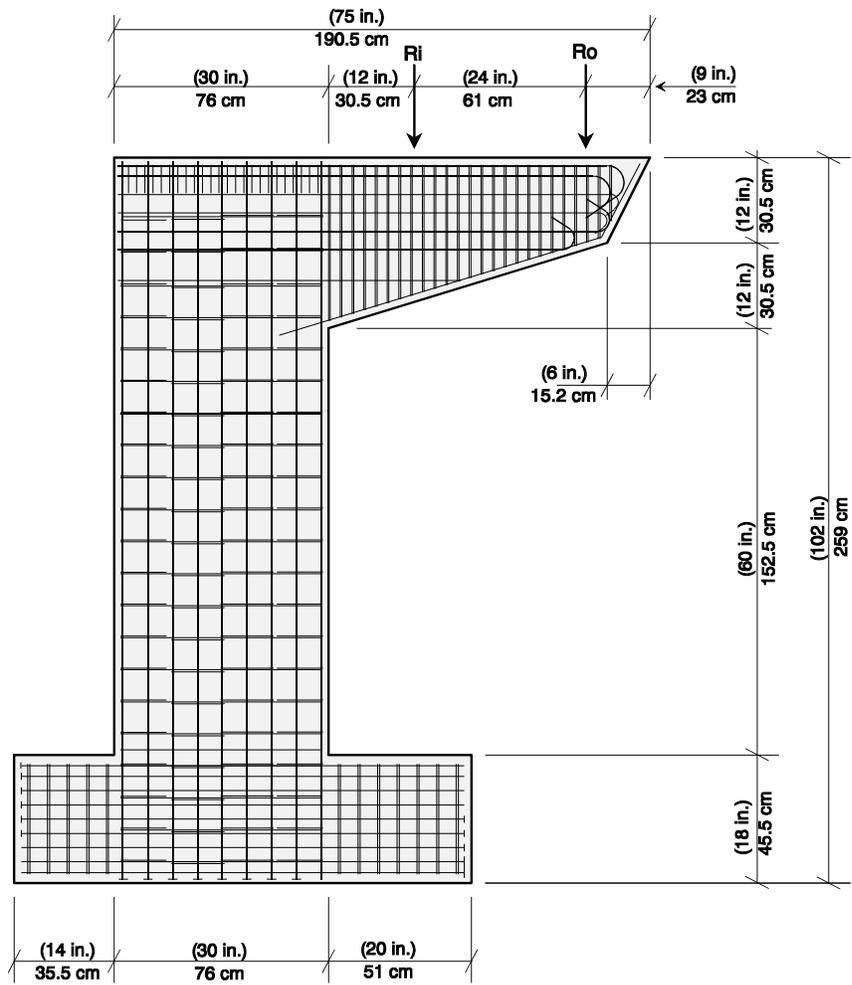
Elevation of reinforcement for POJ-RC-100
